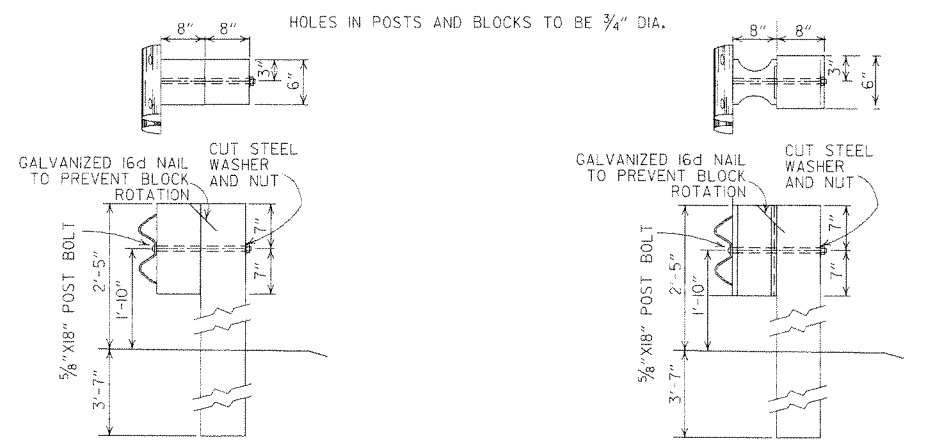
DETAILS OF STEEL LINE POST CONNECTIONS (W-BEAM)
